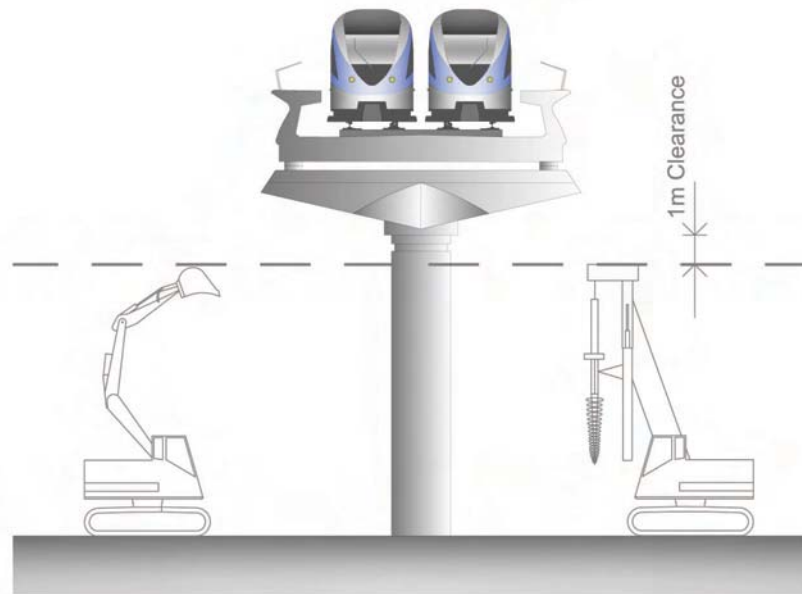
Operation of equipment directly below Railway viaducts should keep minimum clearance from the structure
